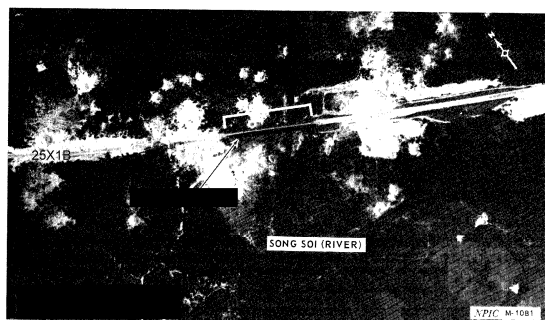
DONG VUONG RR BRIDGE OVER SONG SOI, KEP THAI NGUYEN RAIL LINE, NORTH VIETNAM
